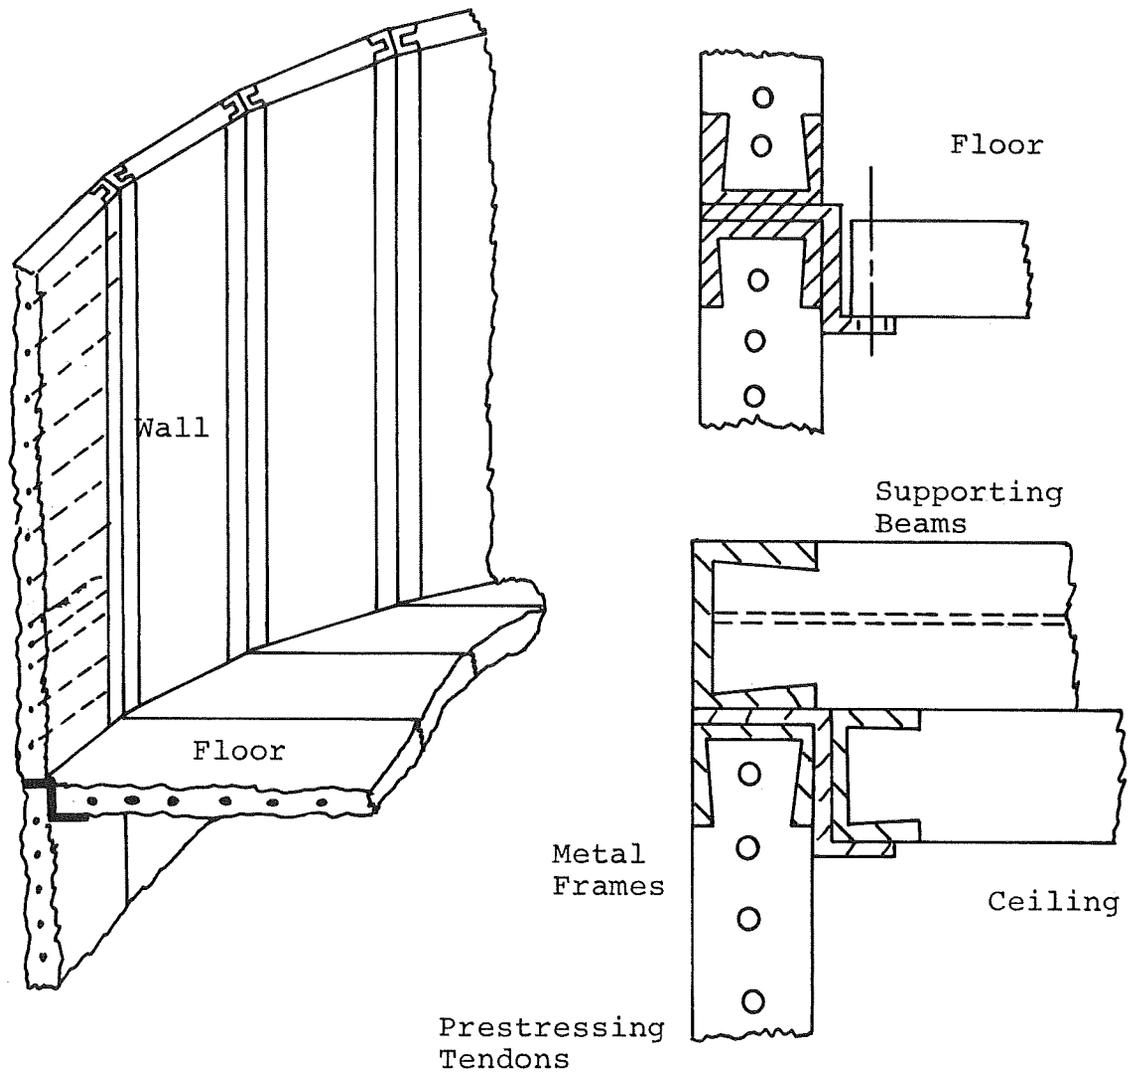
Wall, Floor and Ceiling Joining Techniques
